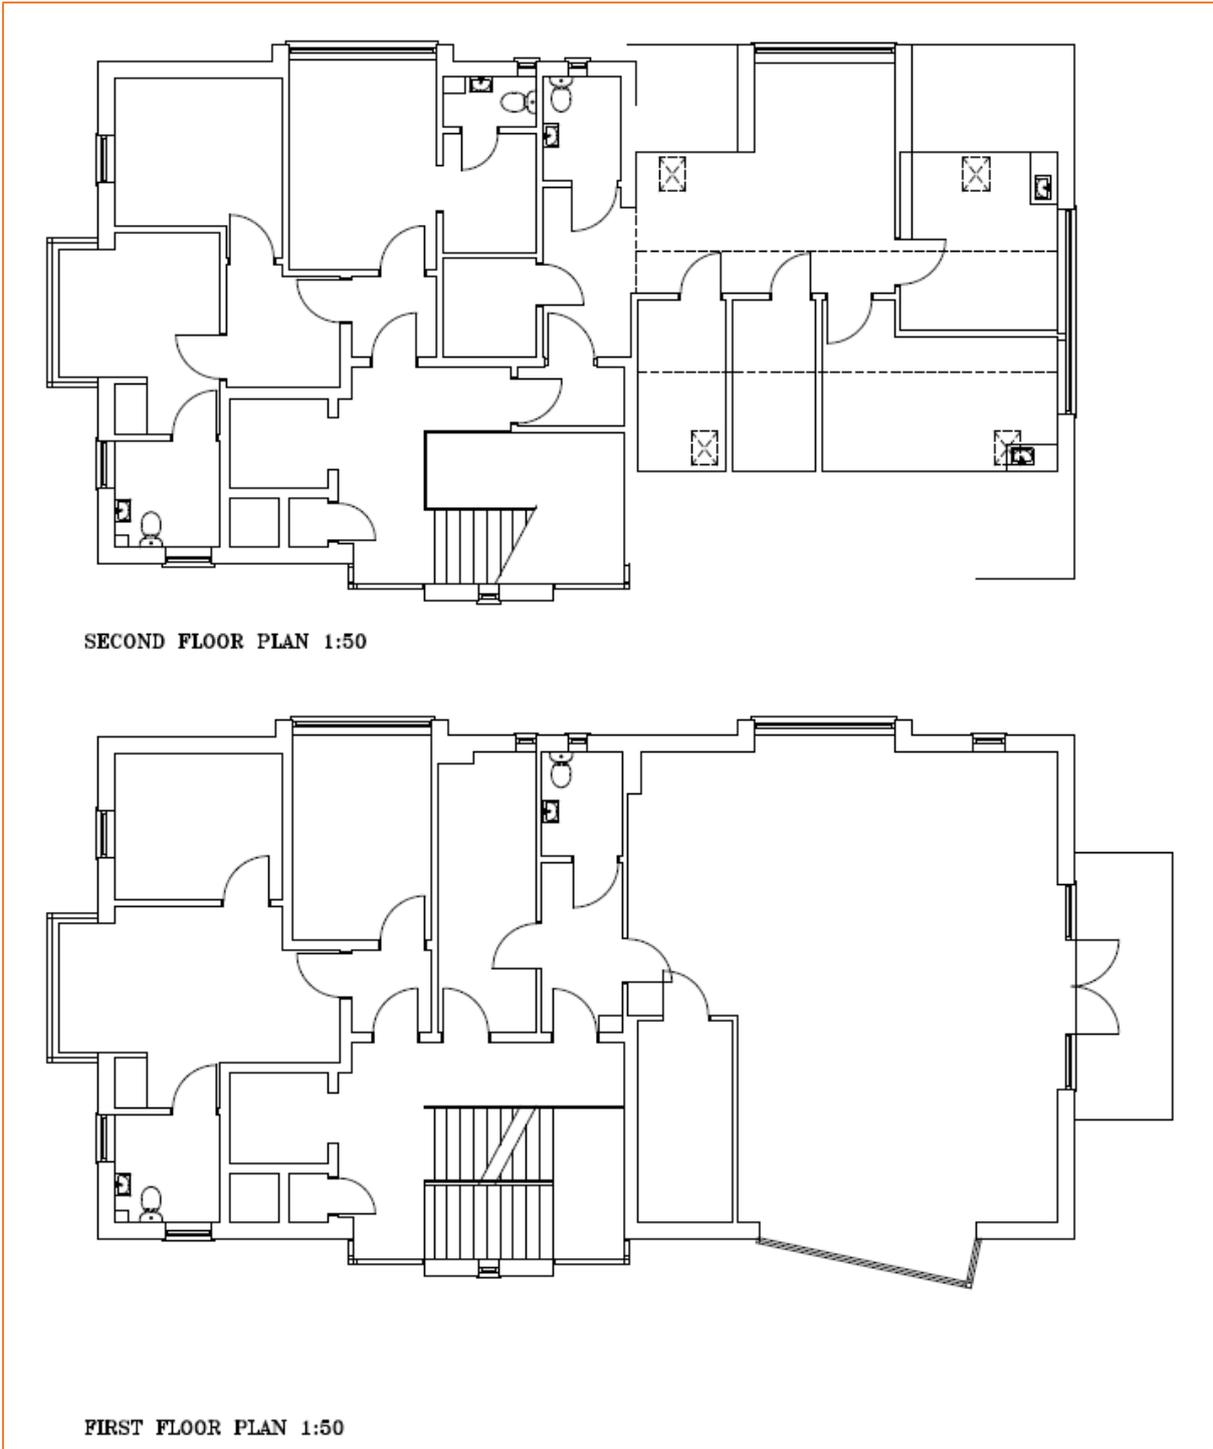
Existing Flood Plans (Source: Eddystone SIPP.)
